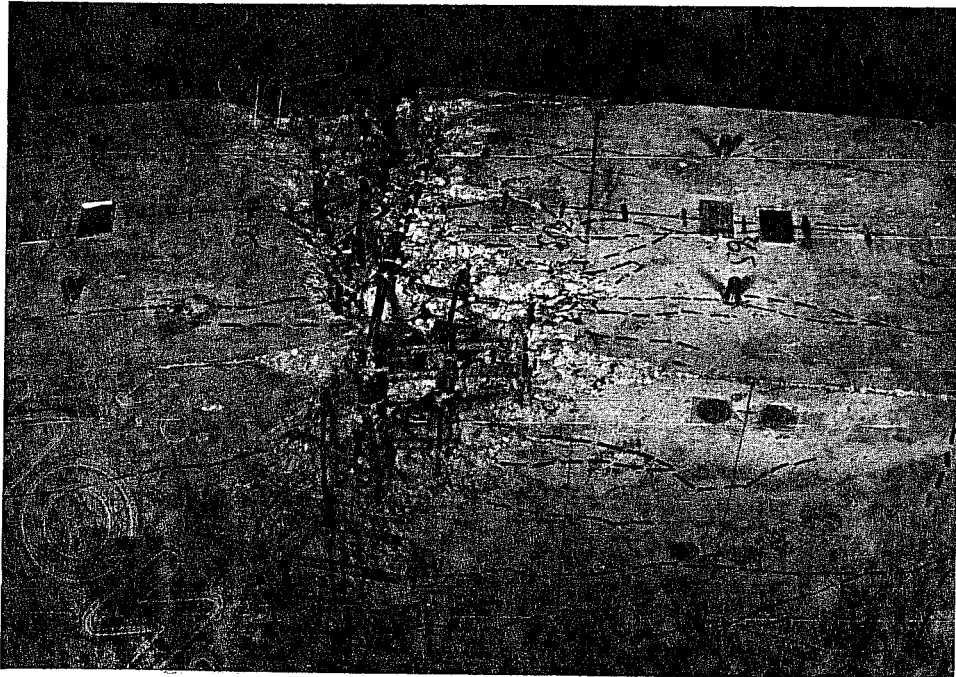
Specimen 1S Compression(top) and Tension Face Failure
